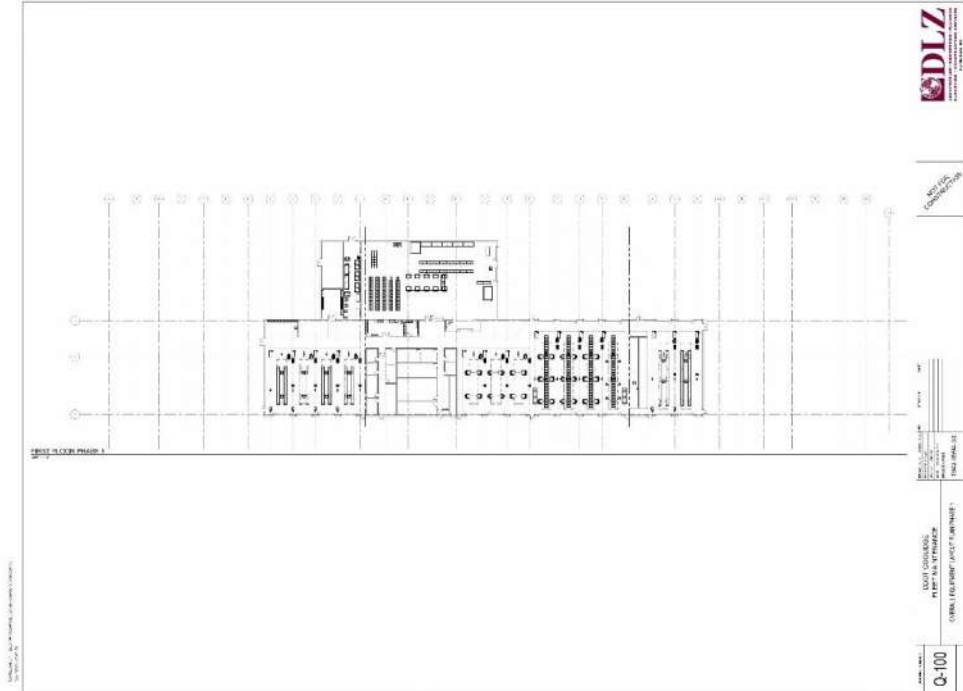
Fleet Maintenance Floor Plan (Full Build-out)
